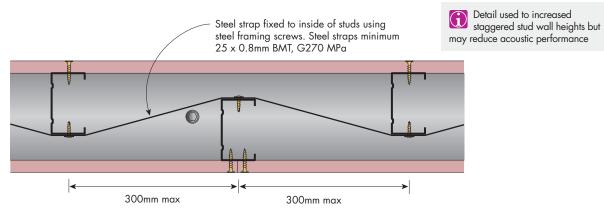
Strap Nogging for Staggered Stud Walls Plan
